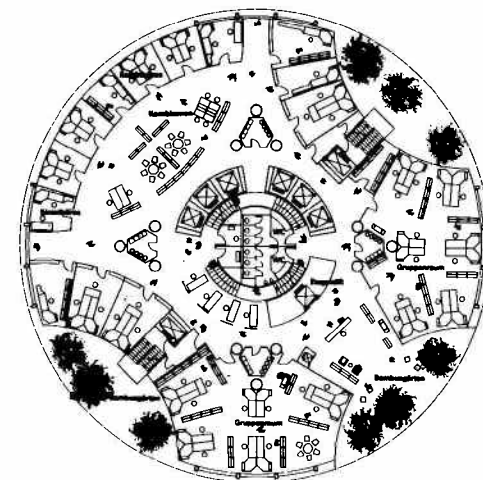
Plan showing equipment core, surrounded by offices and lenticular gardens
